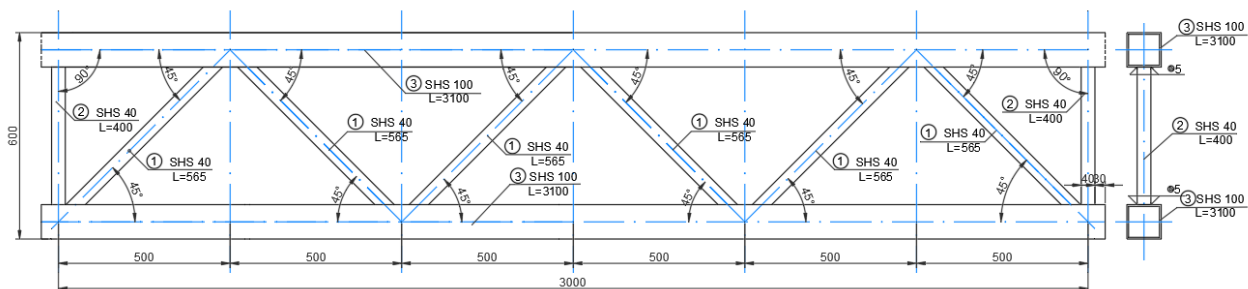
Geometry of welded aluminum lattice girder
